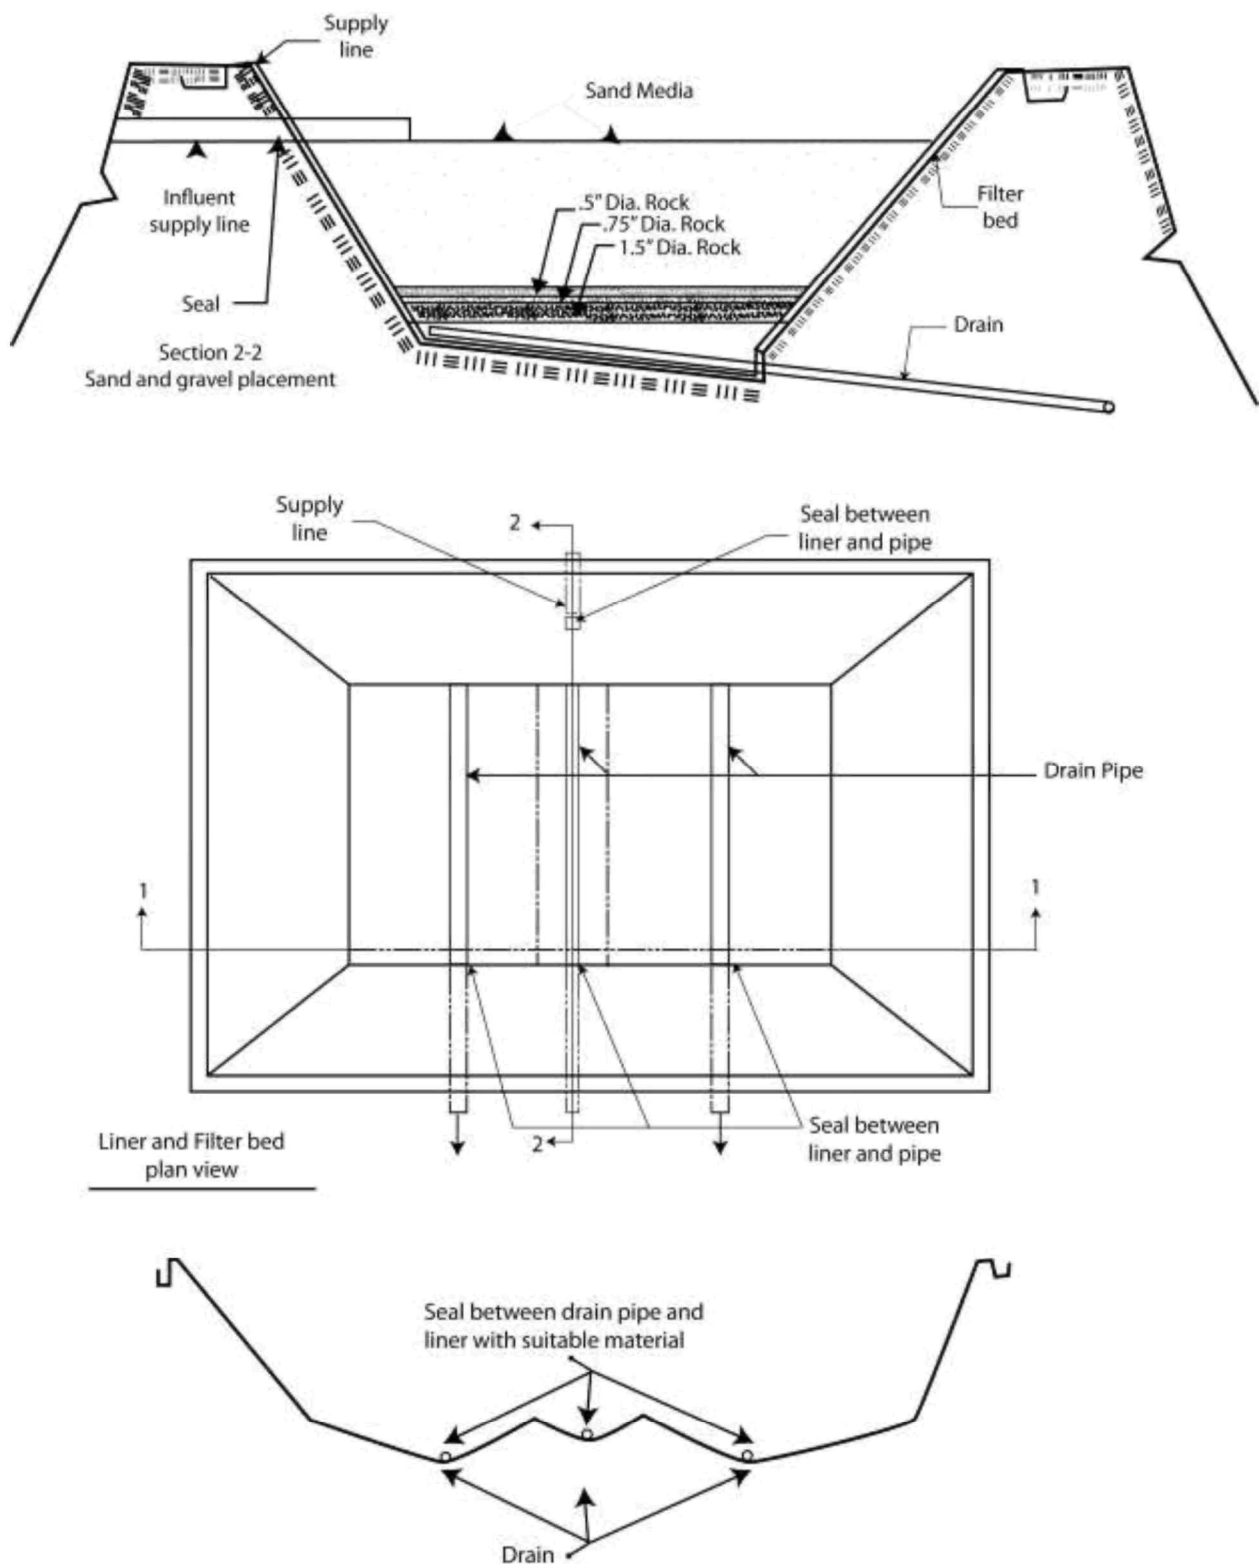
Cross-sectional and plan views of a typical intermittent sand filter (U.S. EPA, 1983a).
